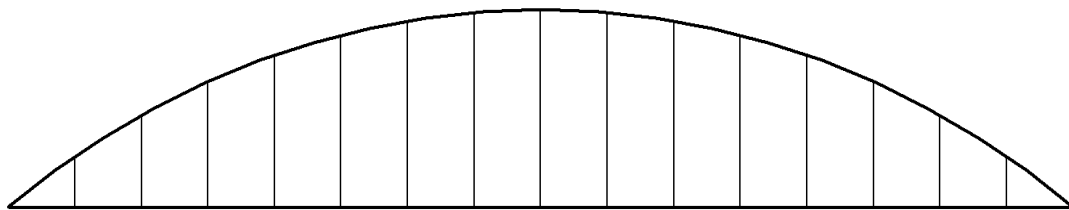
Arch rise of 17 m, span of 100 m and 15 hangers
